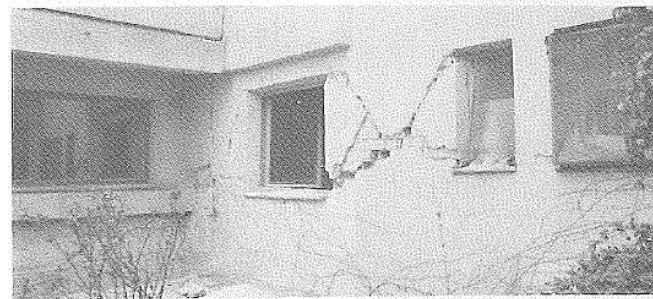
Masonry wall at the ground floor of G+4 buildings [8]
